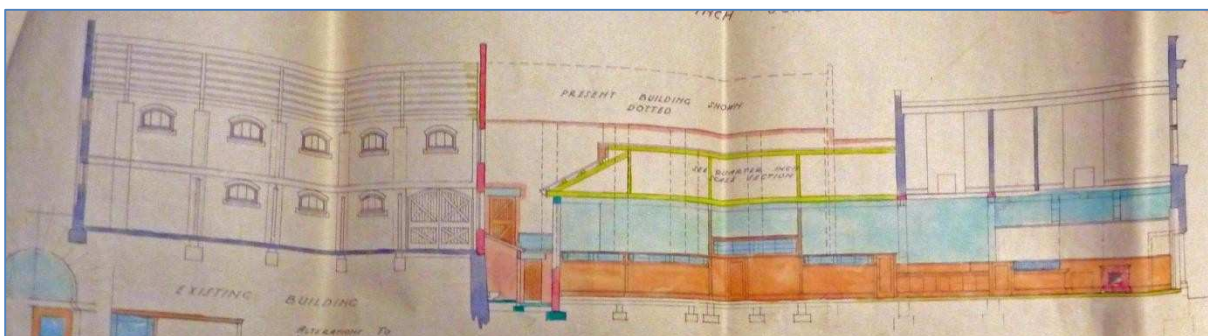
Sectional elevation from 1936 application for alterations to the bank. The 1912 bank premises are on the far right and the old store building on Trafalgar place is shown on the left. The dotted lines indicate the extent of the store building to be removed for the extension to the bank. Note also the height differential between the Elizabeth Street and Trafalgar Place levels (TAHO, AE417/1/1936, 28 Elizabeth Street (Bank), 6326: Alterations and Additions to Bank of New South Wales, Hobart - Long Section. Reproduced with permission).
